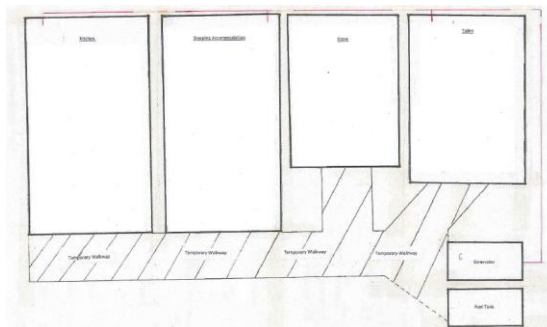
& 4 – Photo showing typical Cabin unit/ Site layout
